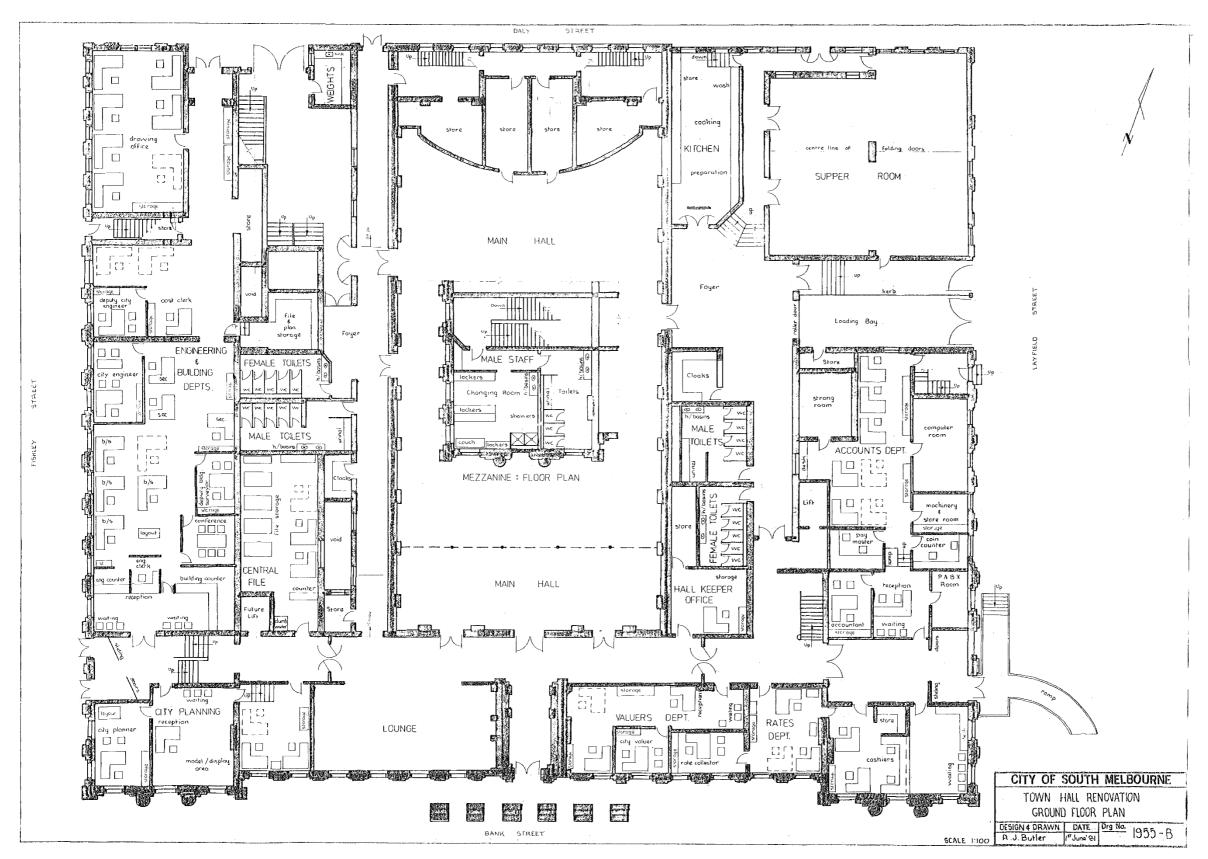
1981 Ground Floor Plan of proposed renovations; while it is believed that the full program of renovations may not have been implemented, some of the layout and elements shown were constructed, either prior to 1981 (i.e. existing conditions) or subsequently
